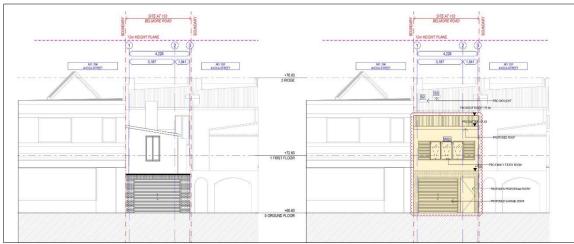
Existing (L) and proposed (R) Avoca Street elevations (Square One Atelier)
